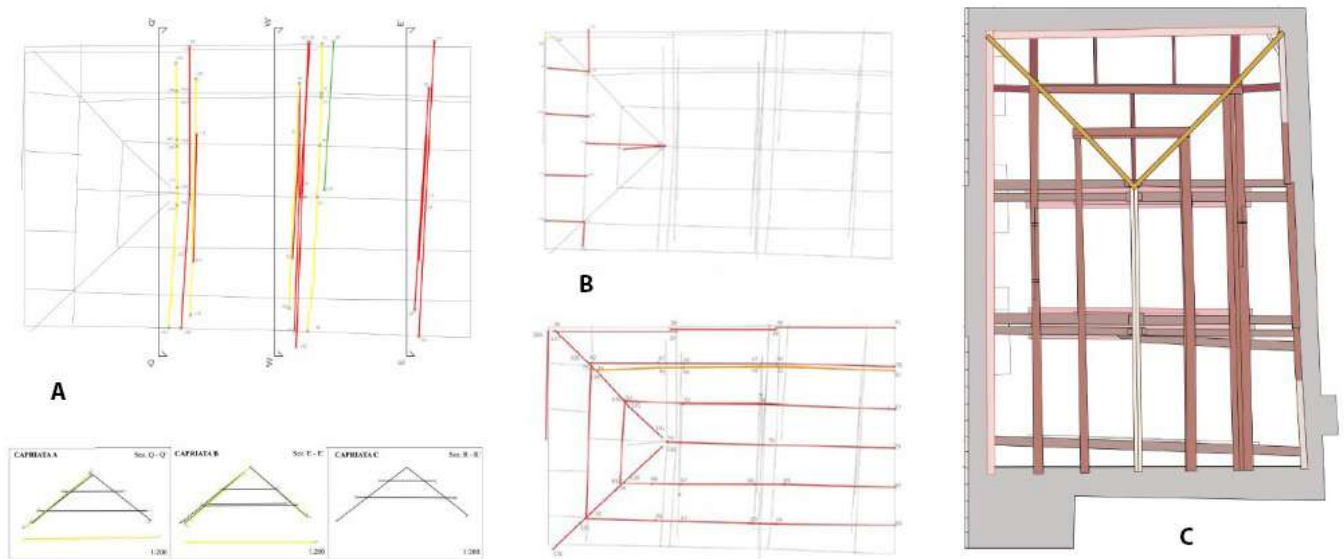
A-Draft survey plan and section of the trestle structures. B-Draft survey plans of props and purlins C-Detailed plan of the roof elements.
